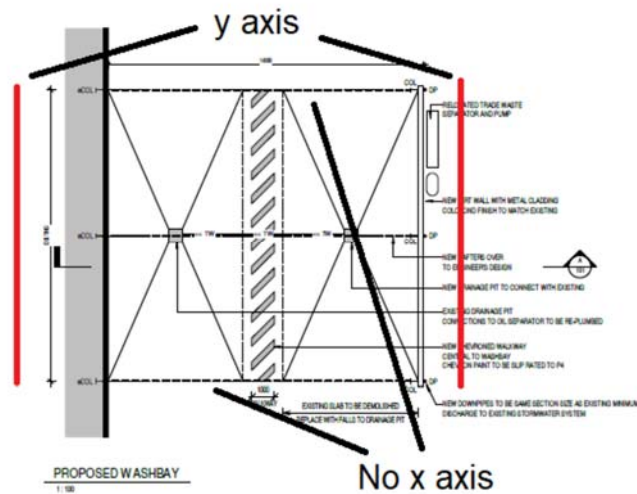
Washbay Floor Plan (Source: StruXi Design 2021).
